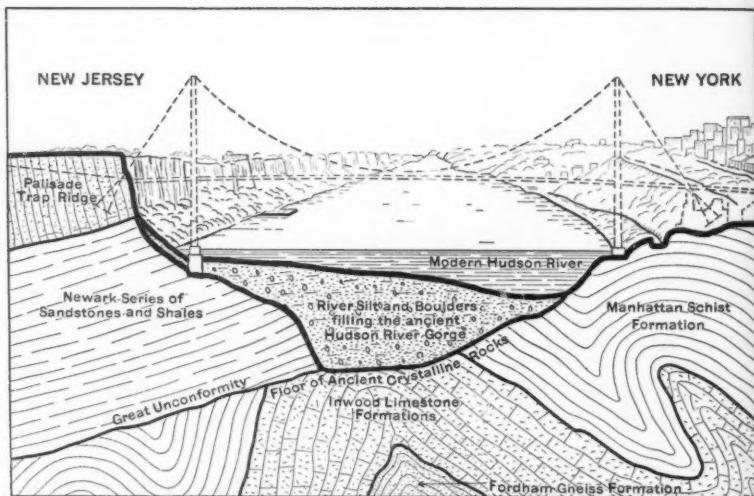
GEOLOGICAL CROSS-SECTION AT SITE OF GEORGE WASHINGTON BRIDGE.
